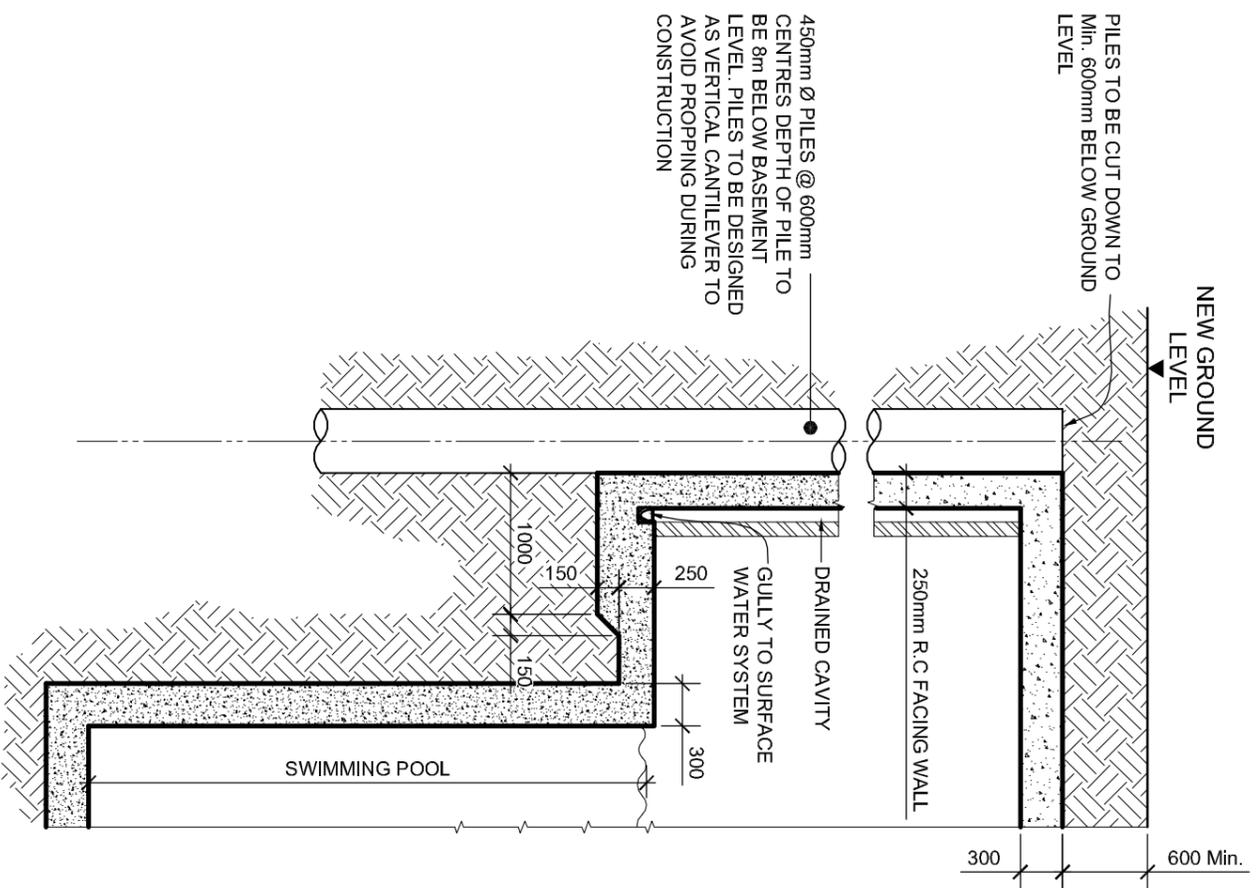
/01 – Basement Plan to Proposed Swimming Pool & Gym
